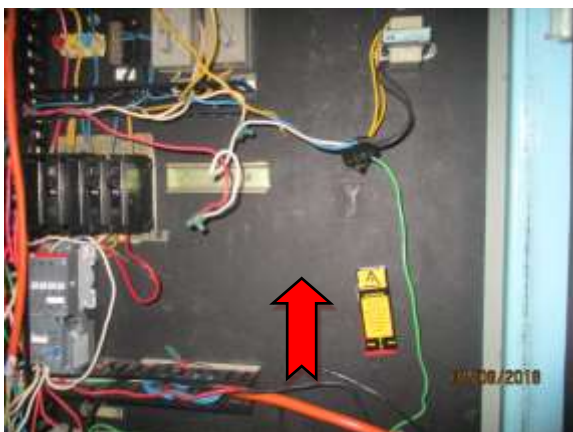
Roof hut 1 to 6, throughout, electrical backing board – suspected asbestos-containing bituminous backing board.
